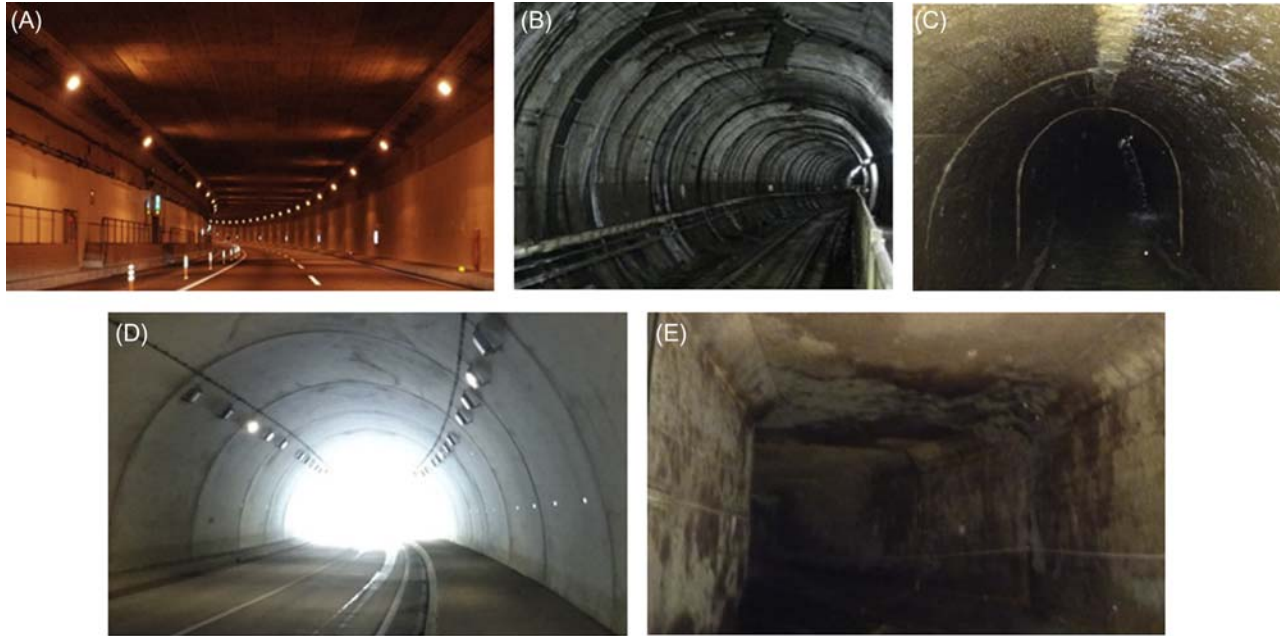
Examples of concrete tunnels: (A) immersed tube tunnel for road, (B) shield driven tunnel for railway, (C) ribbed system tunnel for sanitary infrastructure, (D) NATM tunnel for road, and (E) cut and cover tunnel for drainage.
